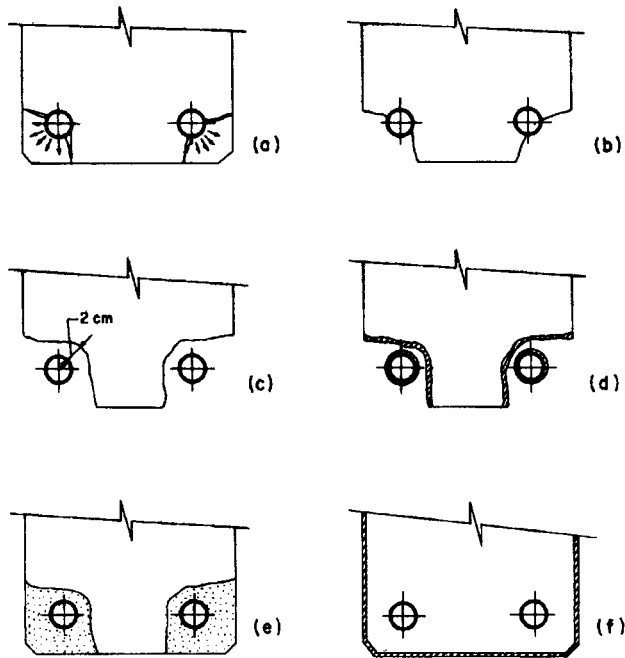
Repair steps of a beam damaged by reinforcement corrosion (repair technique R-D1)
